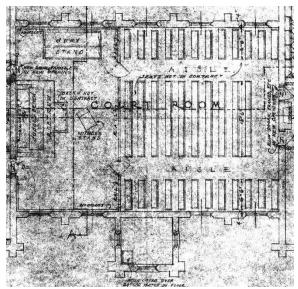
, Fredericksburg Courthouse, Detail, central portion of second floor. J. Binford Walford & O. Pendleton Wright, Renovation drawings, 1948. Courtesy City of Fredericksburg.
